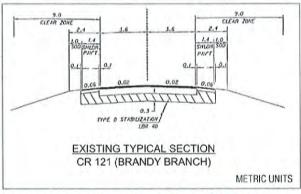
Existing Typical Section from FDOT Bridge Replacement Plans (1999)
